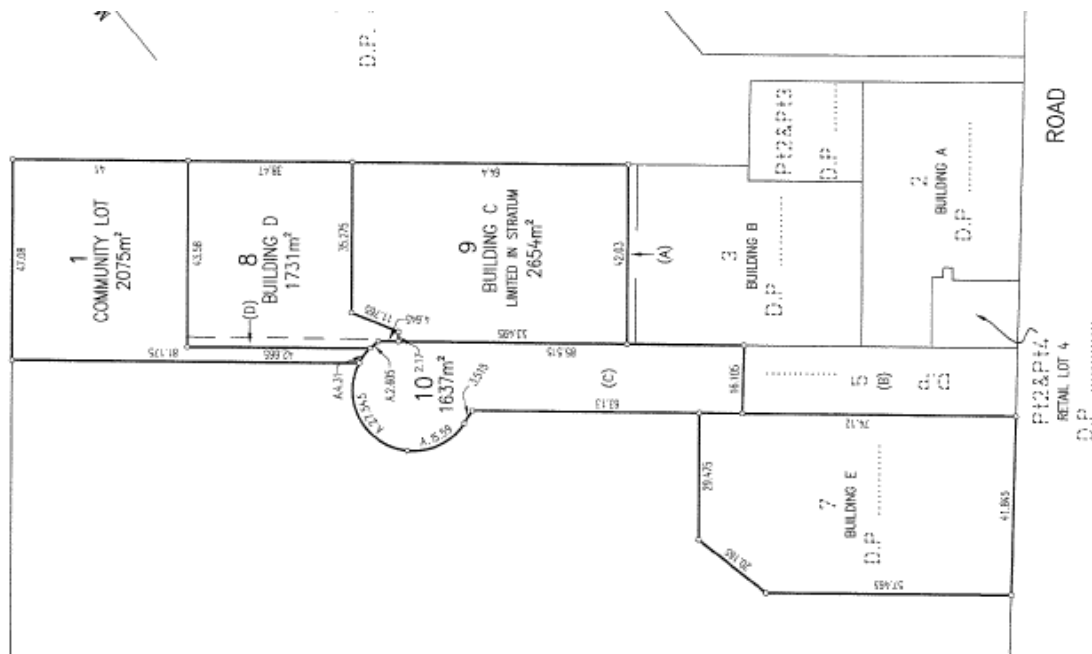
Approved Draft Subdivision Plan. The application relates to lot 7 in the draft plan.
